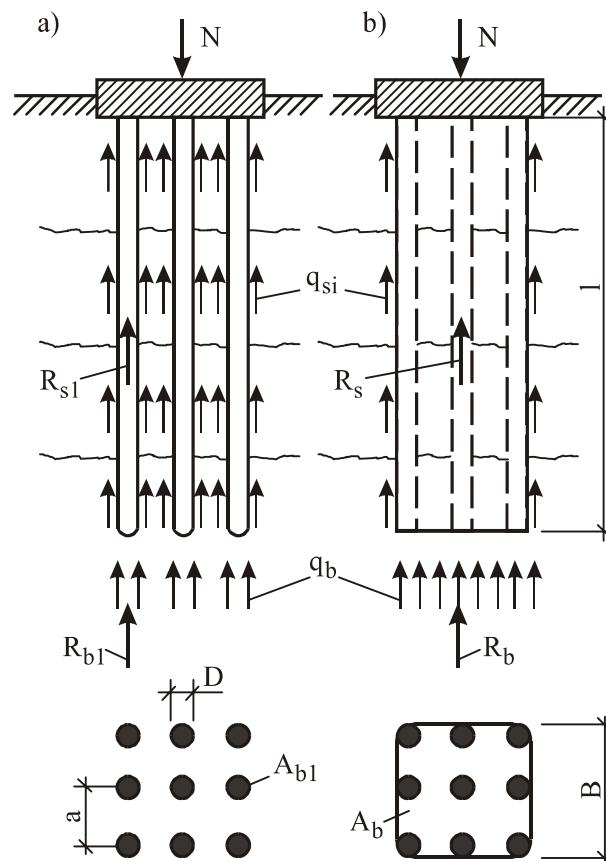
A pile foundation as the group of single piles (a) and the pile block (b)
